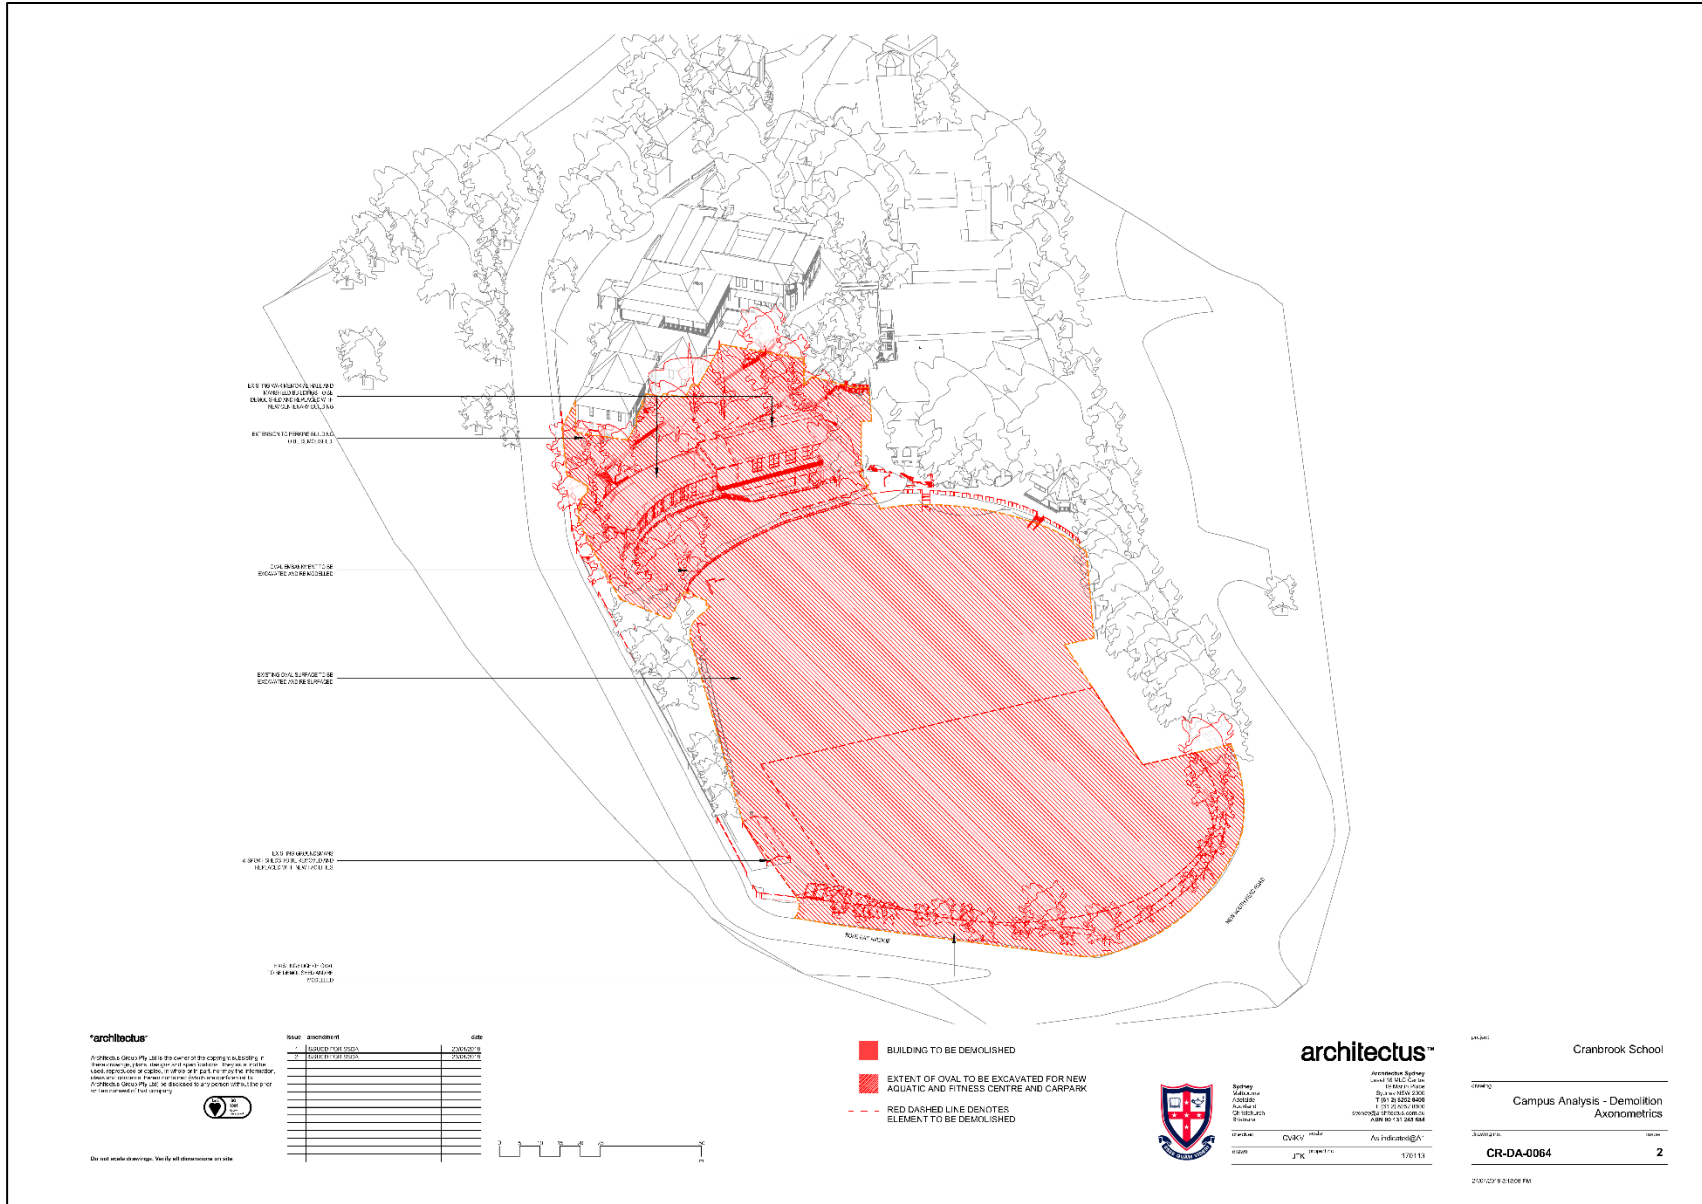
Showing the proposed demolition plan for Cranbrook (plan courtesy of architectus).
